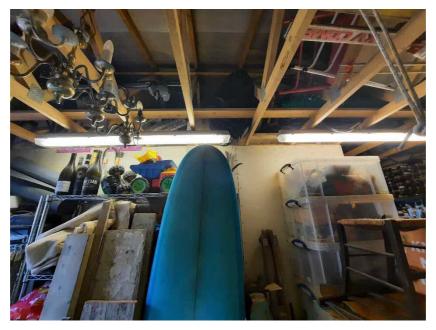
Interior view (towards the south) of the garage at Derna House, showing the timber roof joists and stored items.
